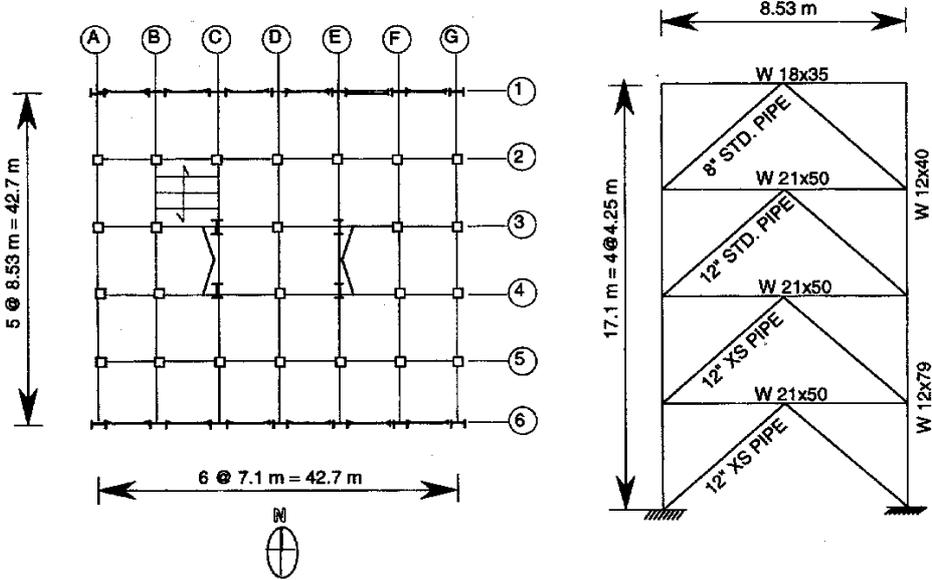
Plan of the study building and OCBF members designed for the UBC seismic forces
